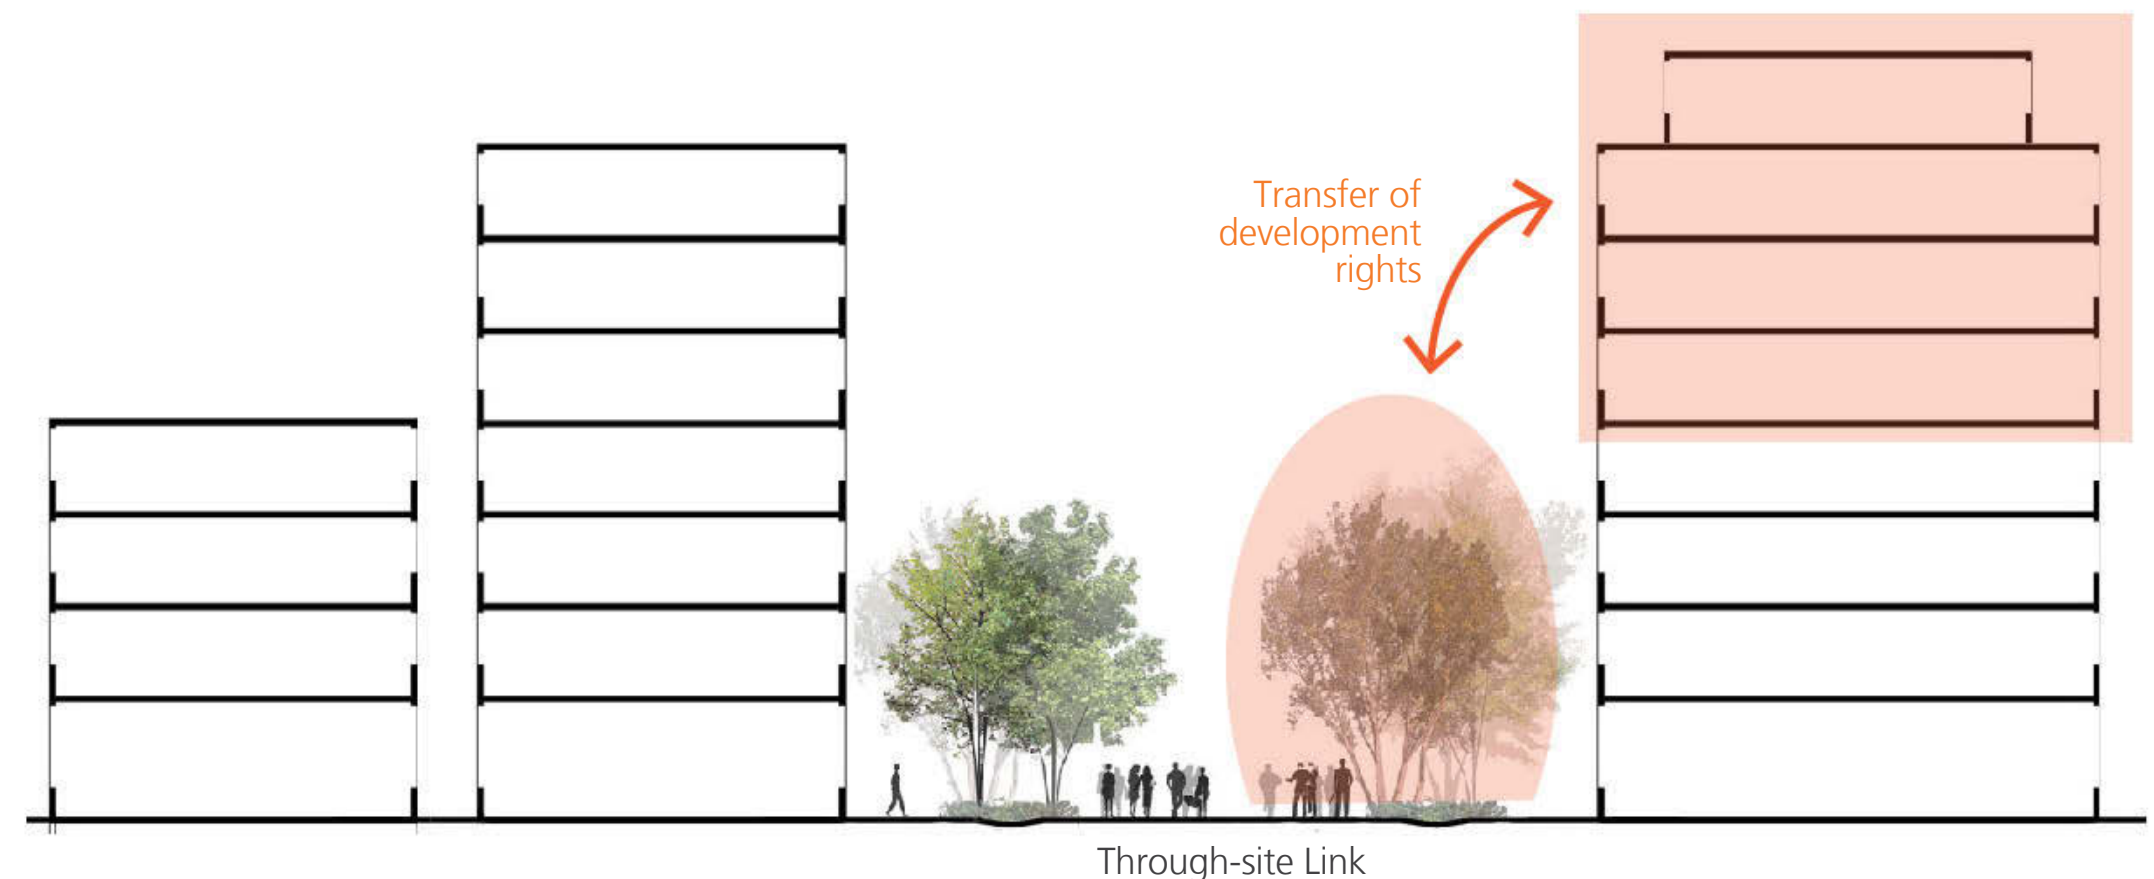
Development providing through site links and other public open space will be provided with the potential to develop to a greater height. This indicative illustration shows how two sites may provide public open space and a through site link to enable taller built form. The taller built form also 'signals' the open space in the landscape when viewed from afar (e.g. the eastern side of the river).
